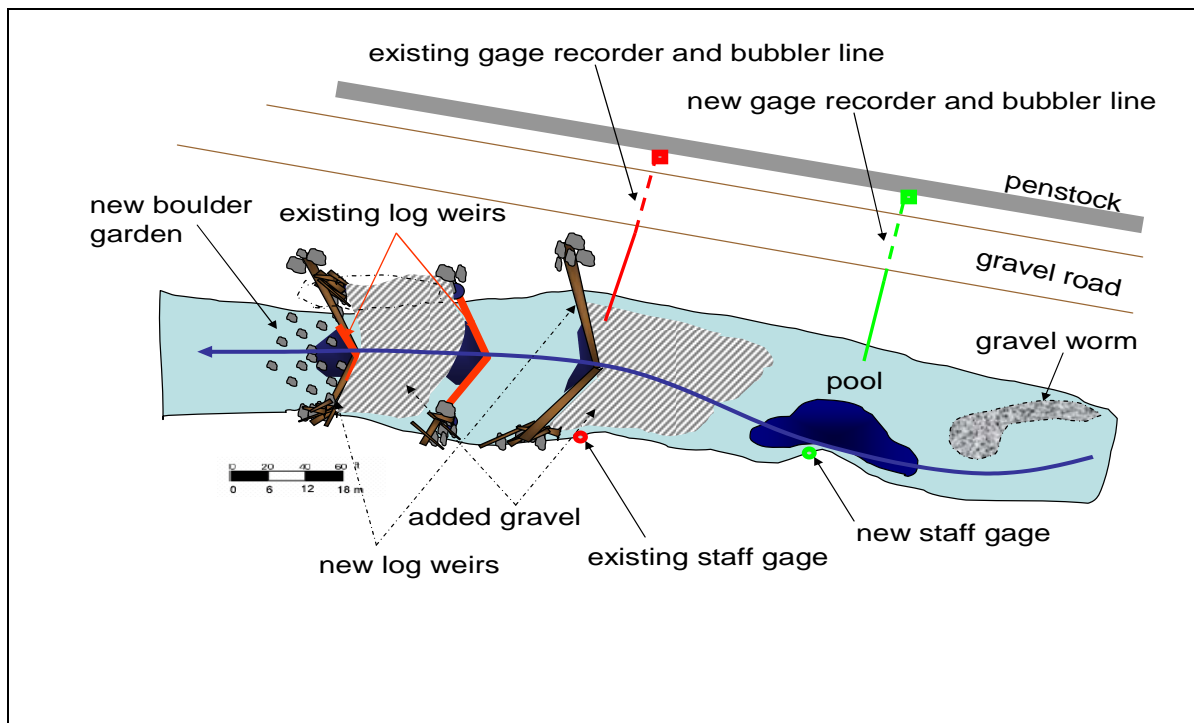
Plan view of the gage site in Soda Springs bypass reach, showing proposed habitat modifications, existing gage location (red), and proposed gage location (green). Bubbler line will be installed at surface grade, except where it is buried under the gravel road.
